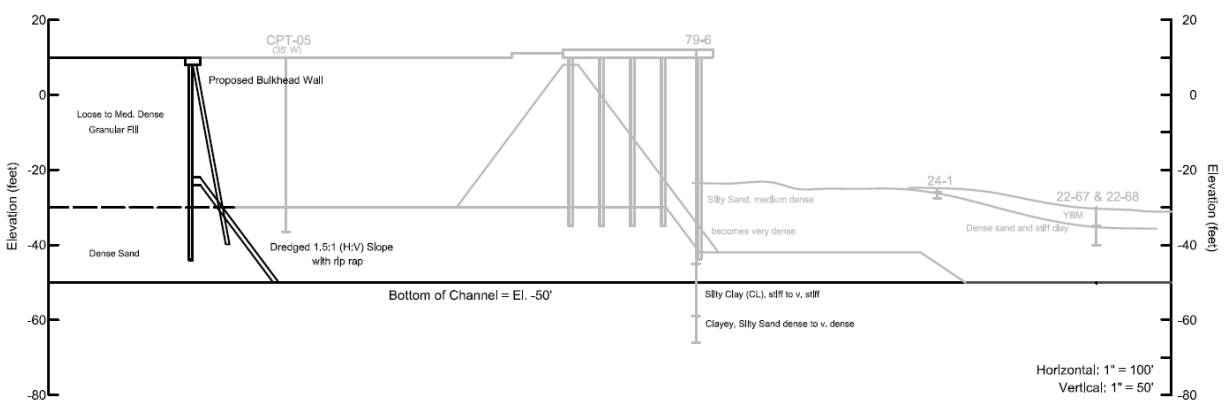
Howard Terminal Cross-Section B-B' (Proposed)
